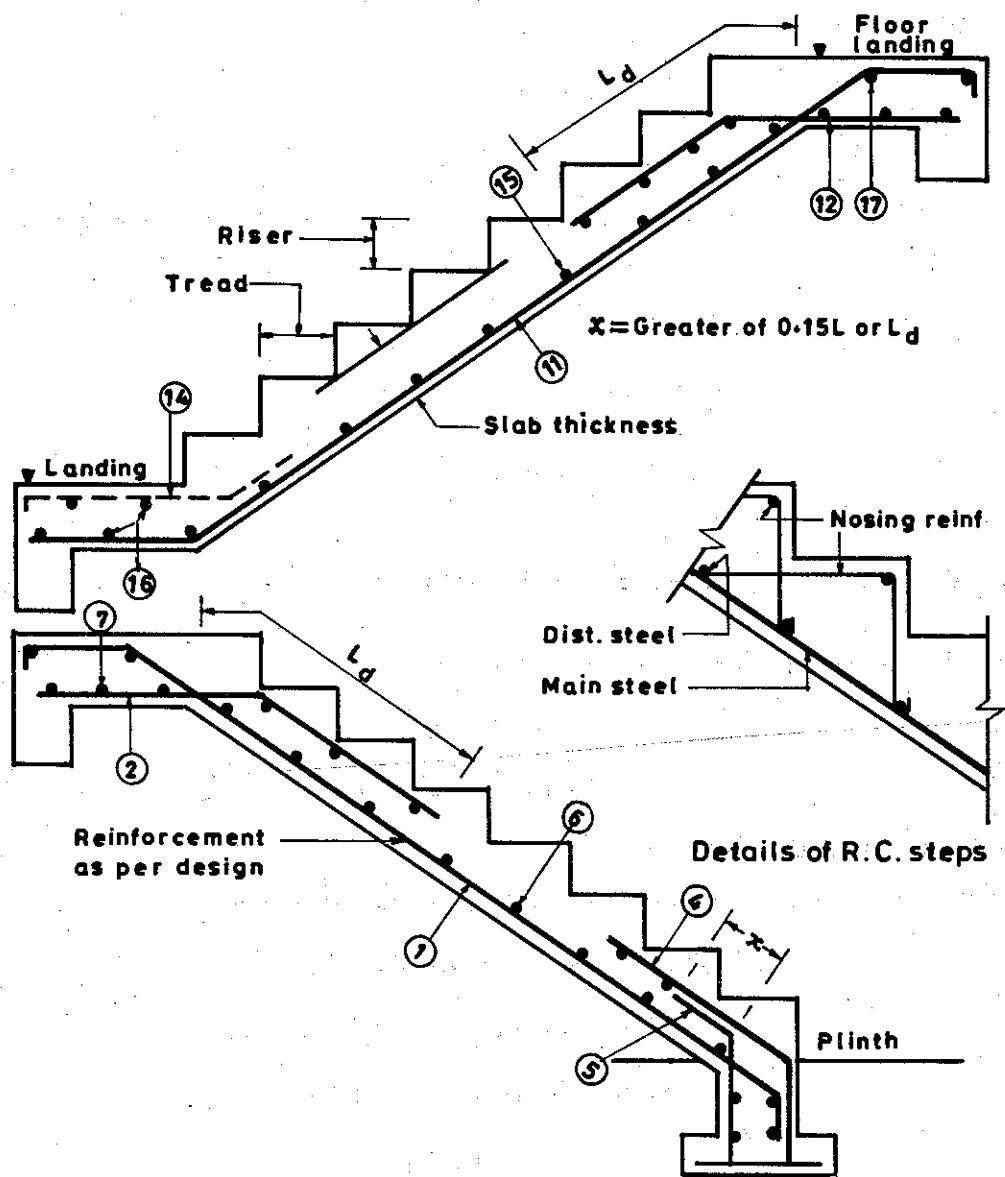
Reinforcement drawing of staircase slabs continuous with landings (1, 2, 11, 12, main tension steel; 14, main tension steel over support; 4, 5, anchorage steel; 6, 7, 15, 16, 17 secondary steel).
